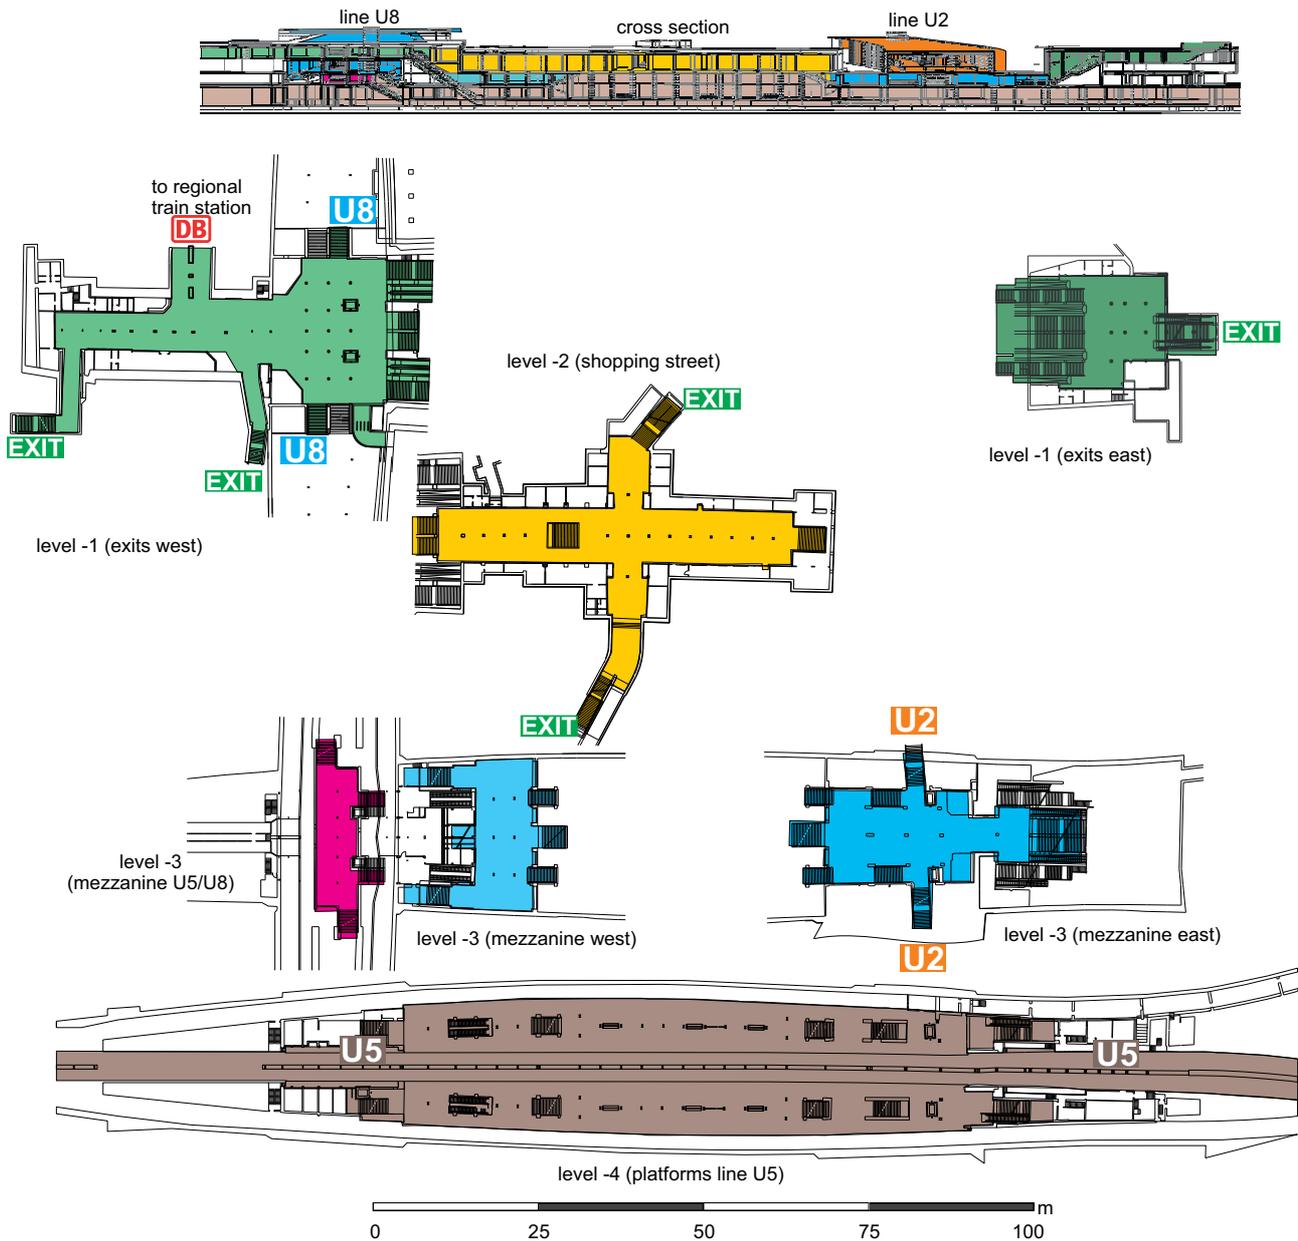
Overview of subway station Alexanderplatz, top: cross section, bottom: plan views.
